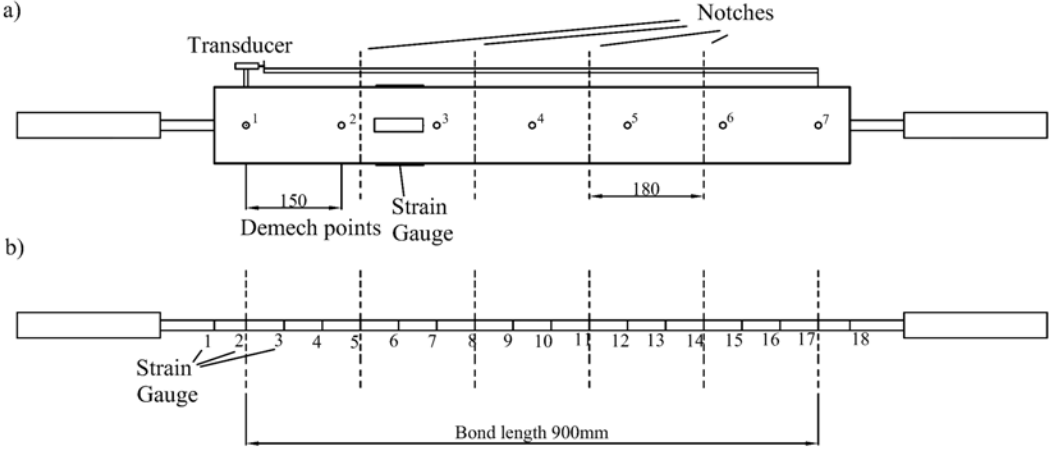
(a) External instrumentation of the concrete specimens. (b) Internal instrumentation of the GFRP reinforcing bar.
